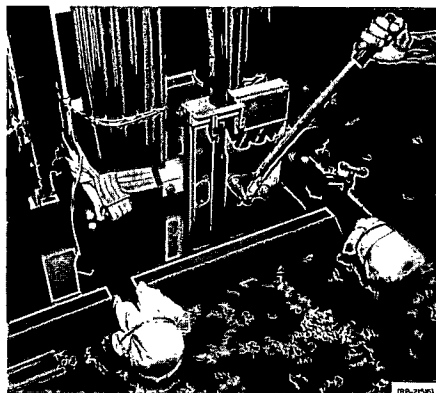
R-3363 POWER WIRE BRAKE USED AT A CABLE HOLE (PAR. 10.041)
